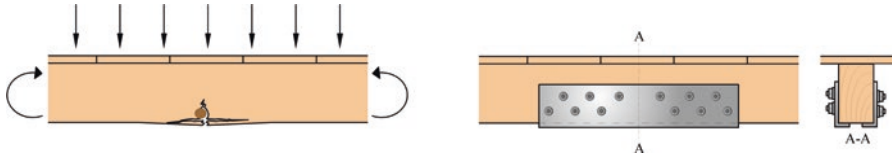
Local reinforcement through the application of exterior steel plates
